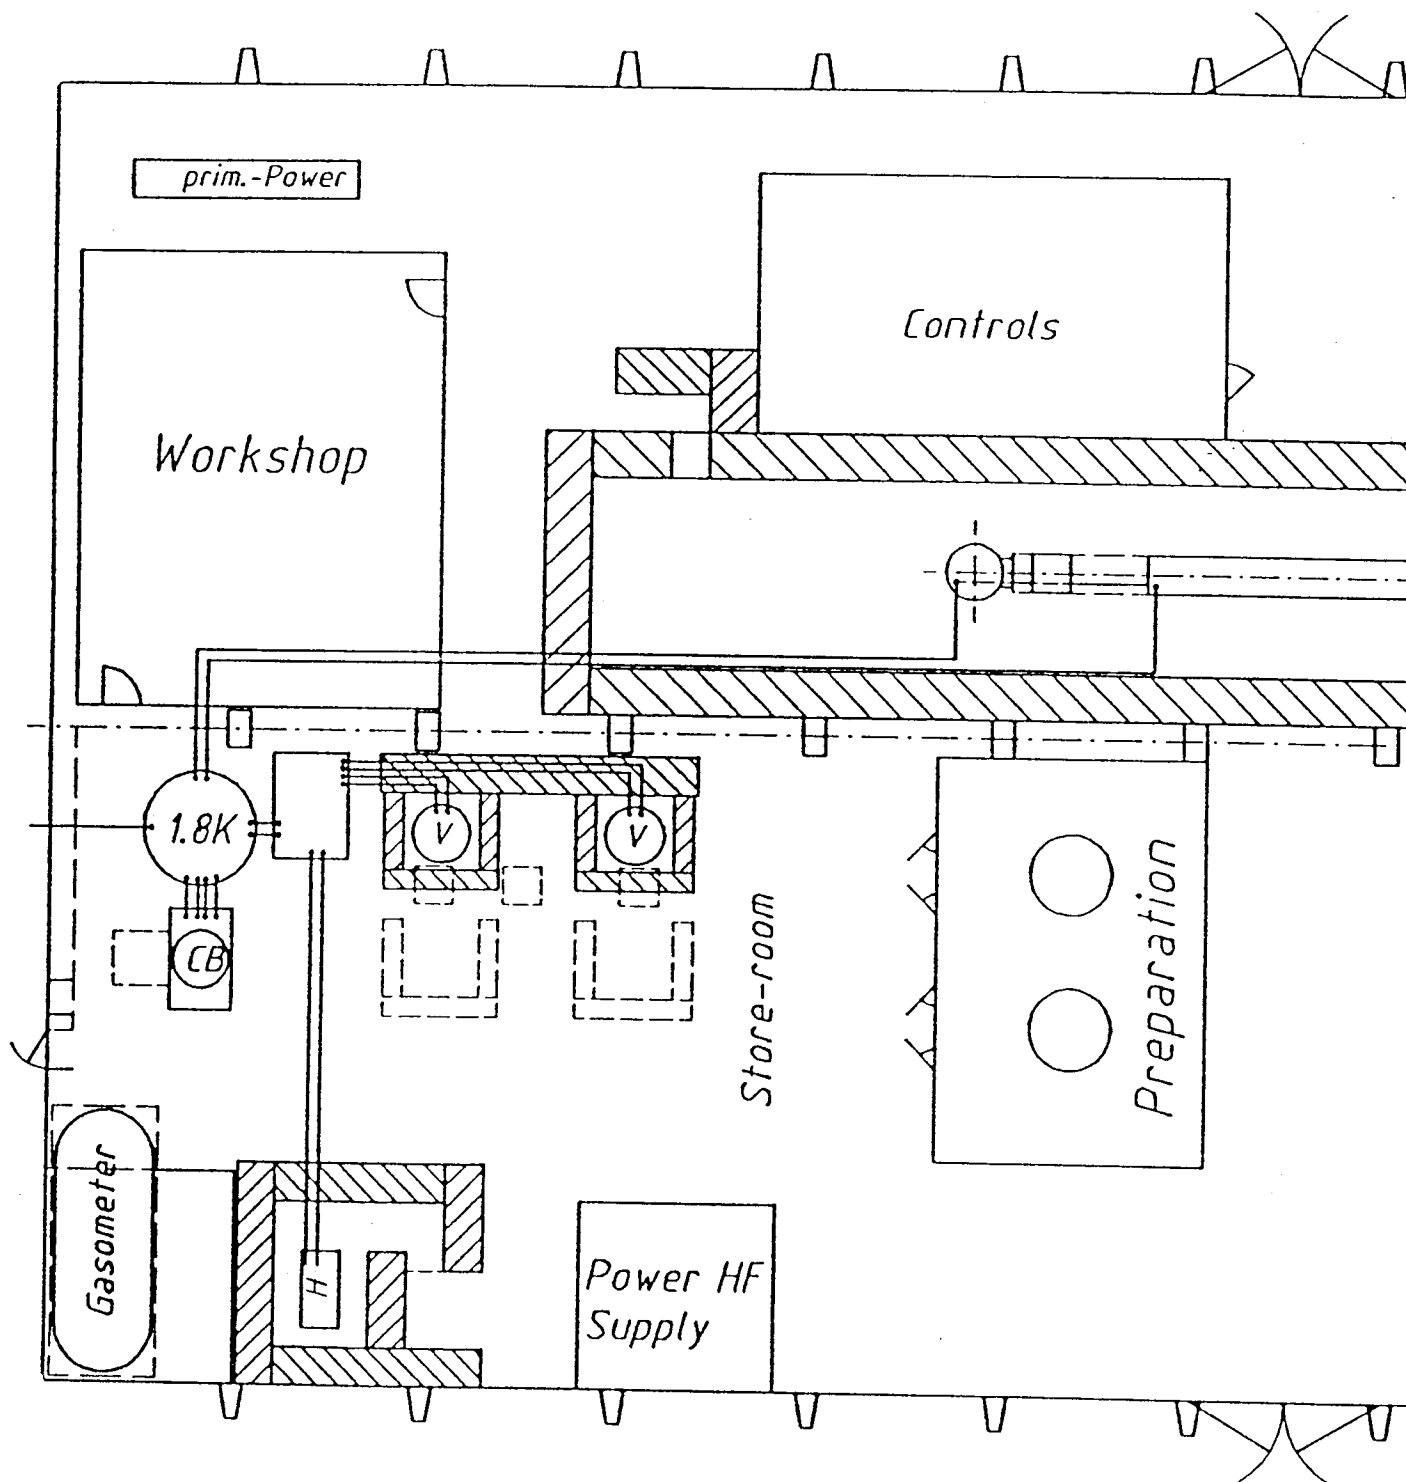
Arrangement at DESY of cryogenic equipment for test facility.
